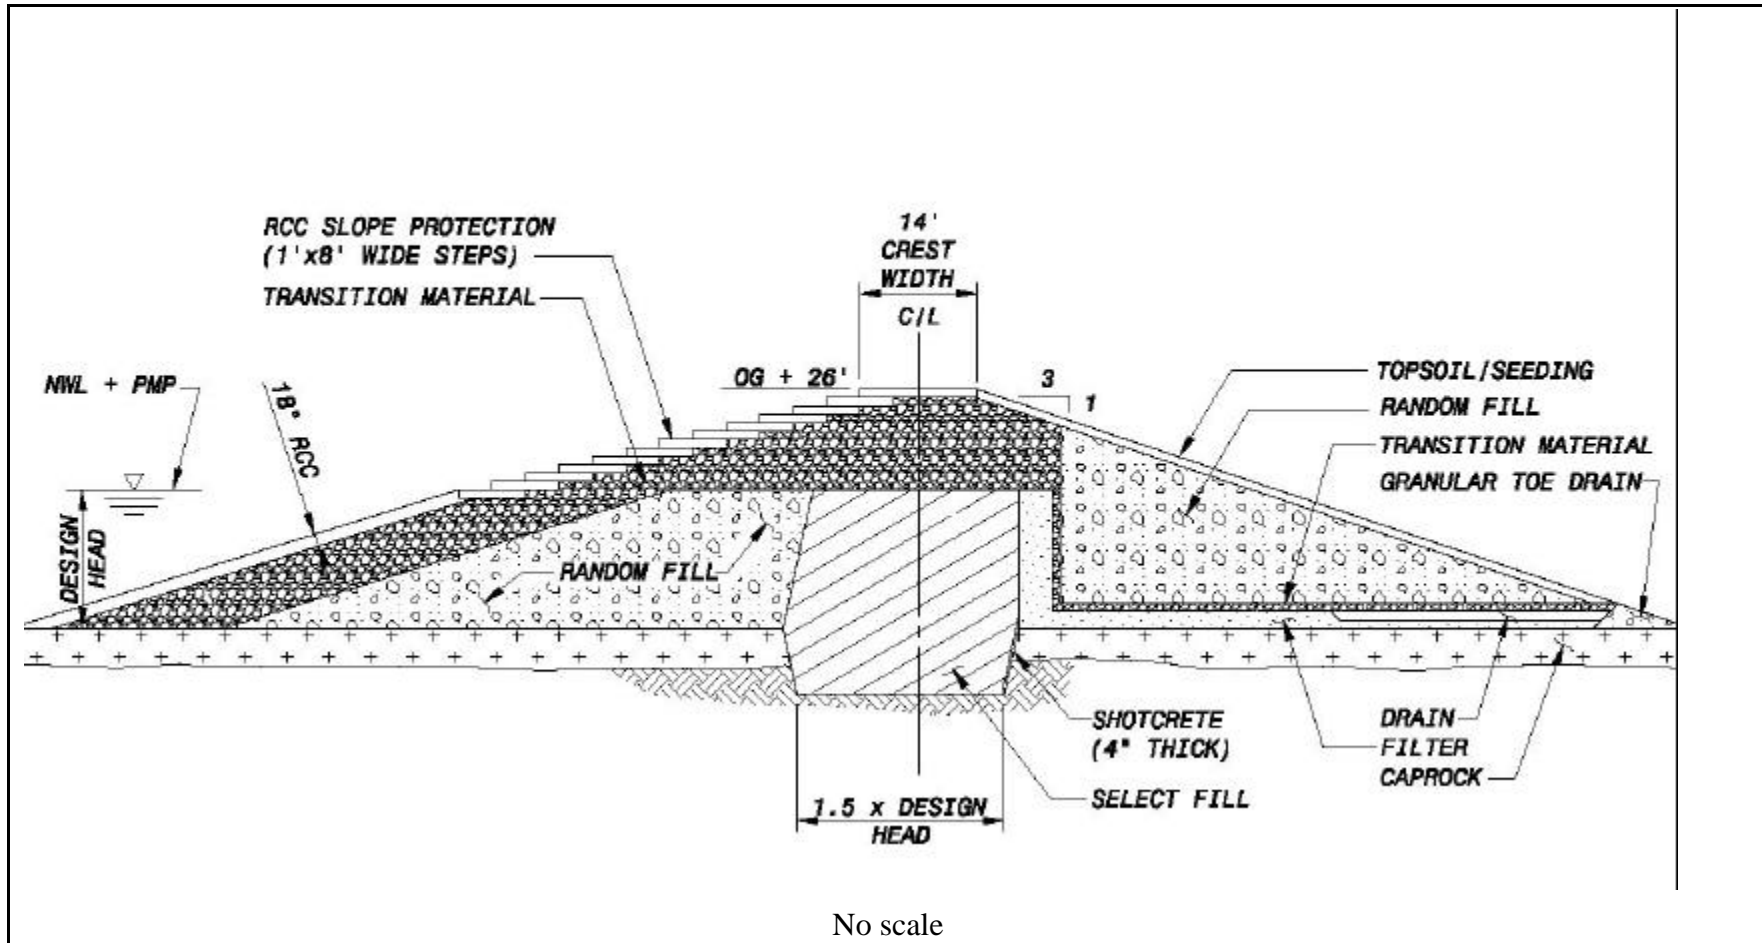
Alternative 3 Embankment with Central Core and Shallow Core Trench
